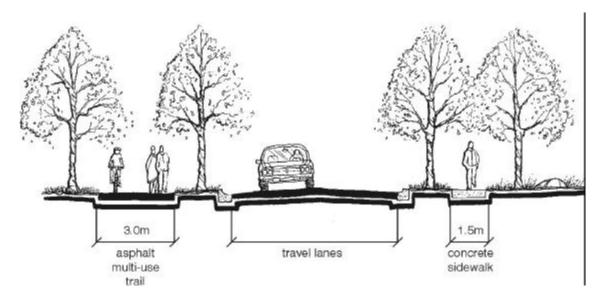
Boulevard Multi-Use Trail, Typical Cross Section
